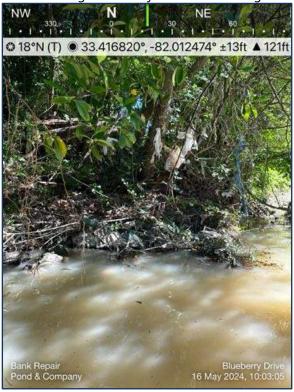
2505 Blueberry Drive, looking downstream at the left bank adjacent to the failing fence line.
